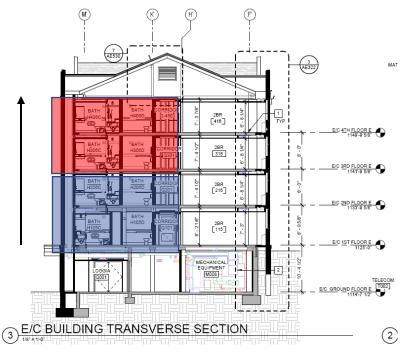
Sectional View of Typical Bathroom Stack | AE 311
